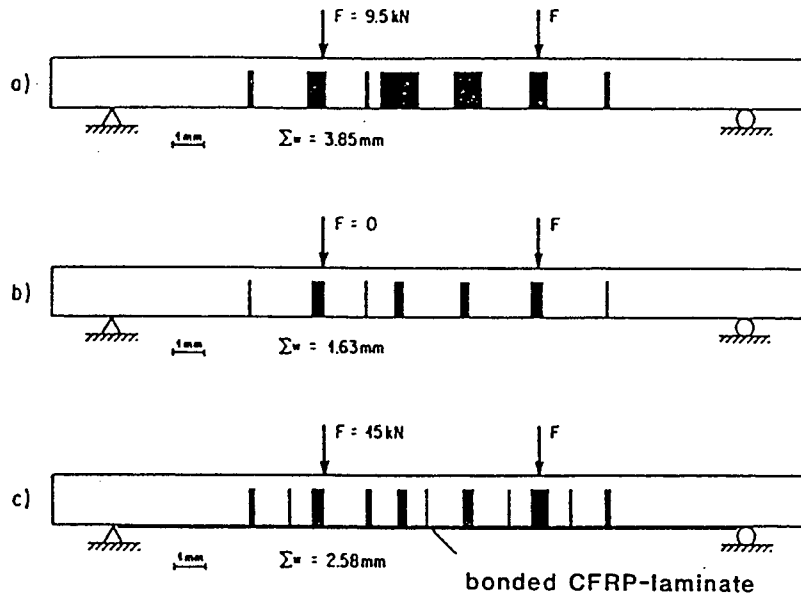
Crack Width in a Beam with and without External FRP Laminates
